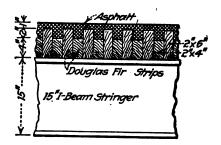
LAMINATED FLOOR, CHICAGO, ILL.
